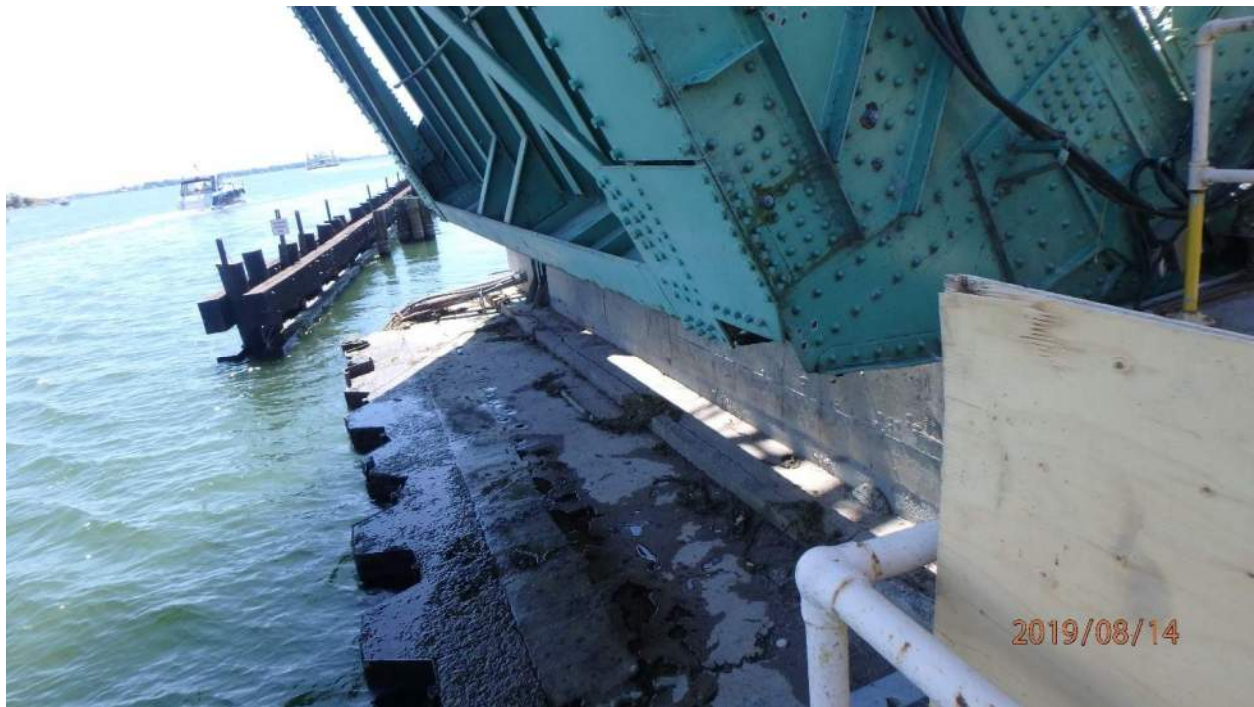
West abutment and ballast wall, looking south (August 14, 2019).
